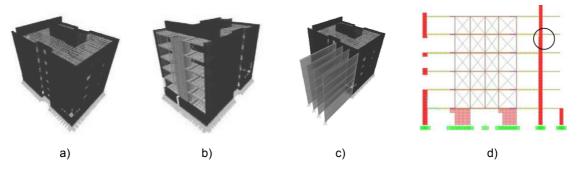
Numerical Model (Branco, 2007): a) Global model of the building; b) Back façade wall with the ceramic brick balconies; c) Final model taking into account the adjacent reinforced concrete building; d) Cross section of the building with the reduction of the masonry wall thickness between the 4th and the 5th floor.
